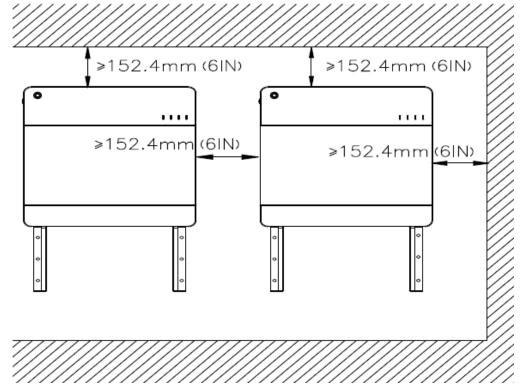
Dimensional Requirements for Wall-bracket Installation
